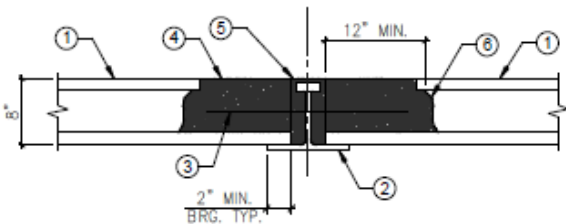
The typical floor plan is 8" hollow-core concrete planks (4'0" wide typ.) that sit on dissymmetrical beams. This system makes up what is known as a Girder-Slab.
